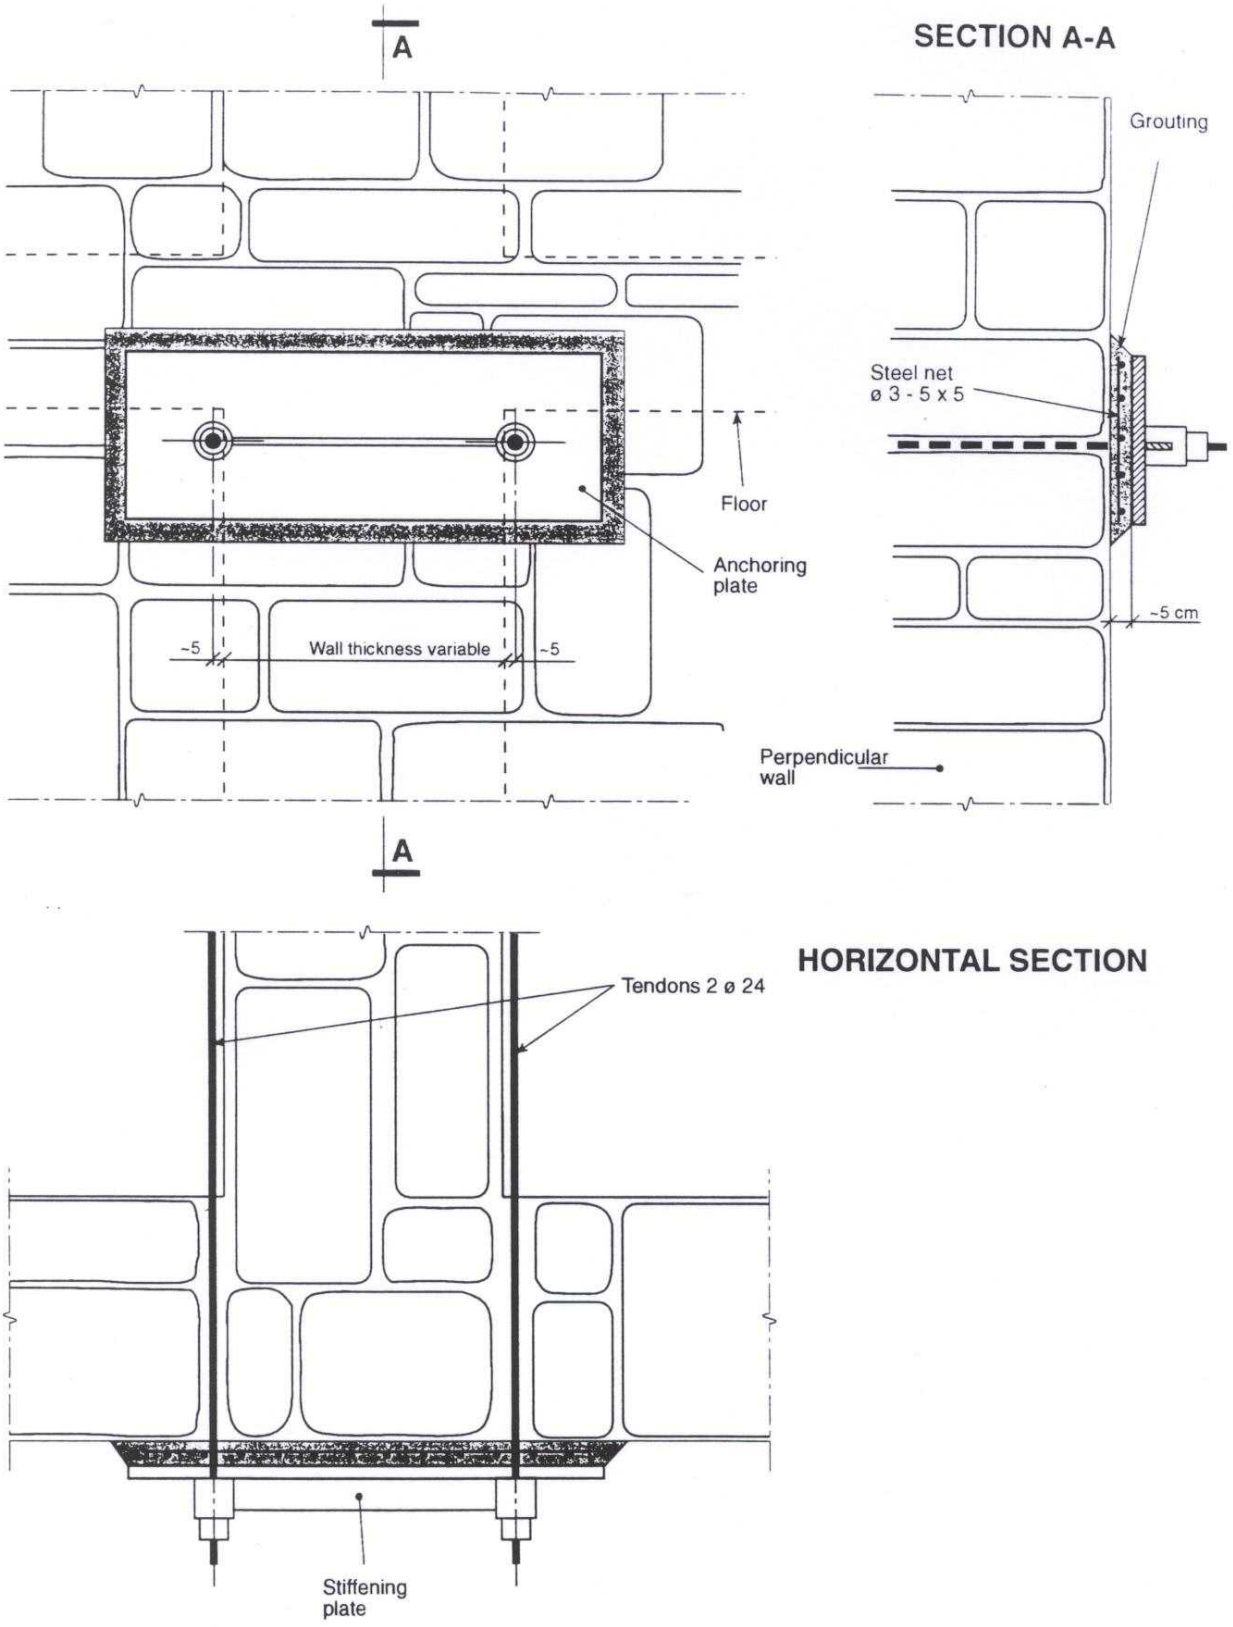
D: Seismic Strengthening - Installation of Ties with an Anchor Plate at the Exterior Wall Face
